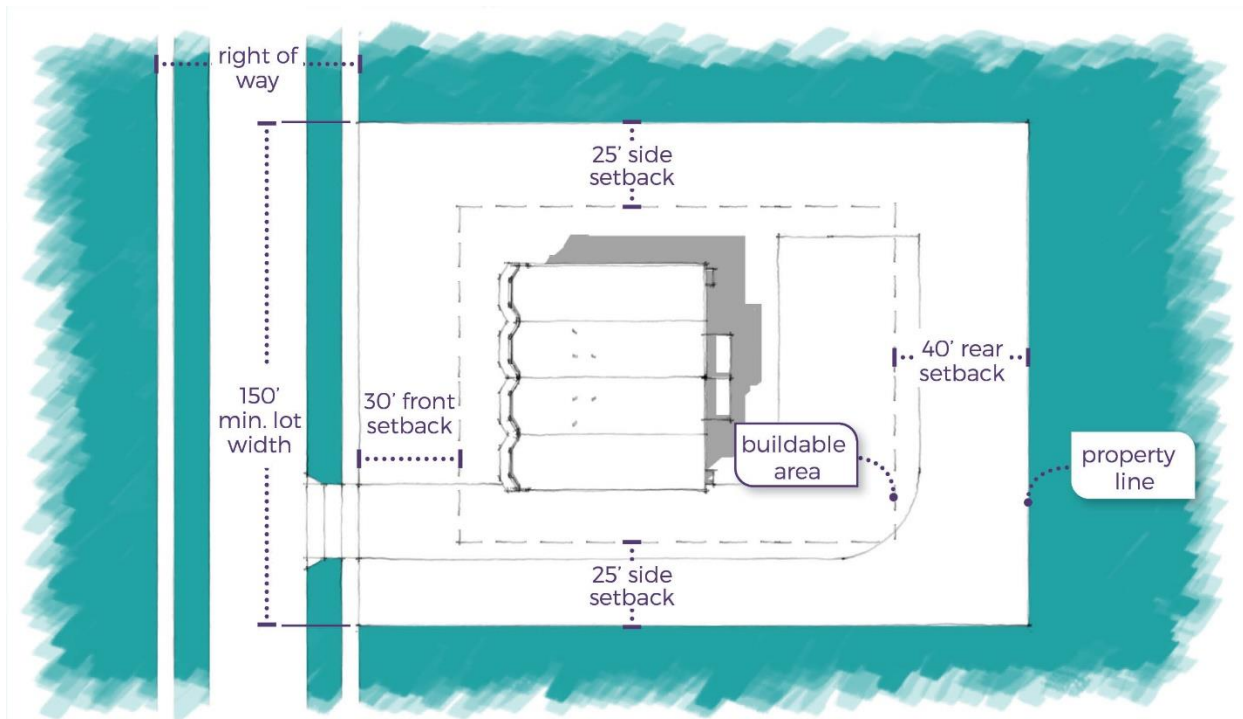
R-3 SITE DEVELOPMENT REQUIREMENTS
